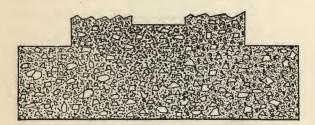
Section of footing for the foundation of a concrete wall for a residence.
